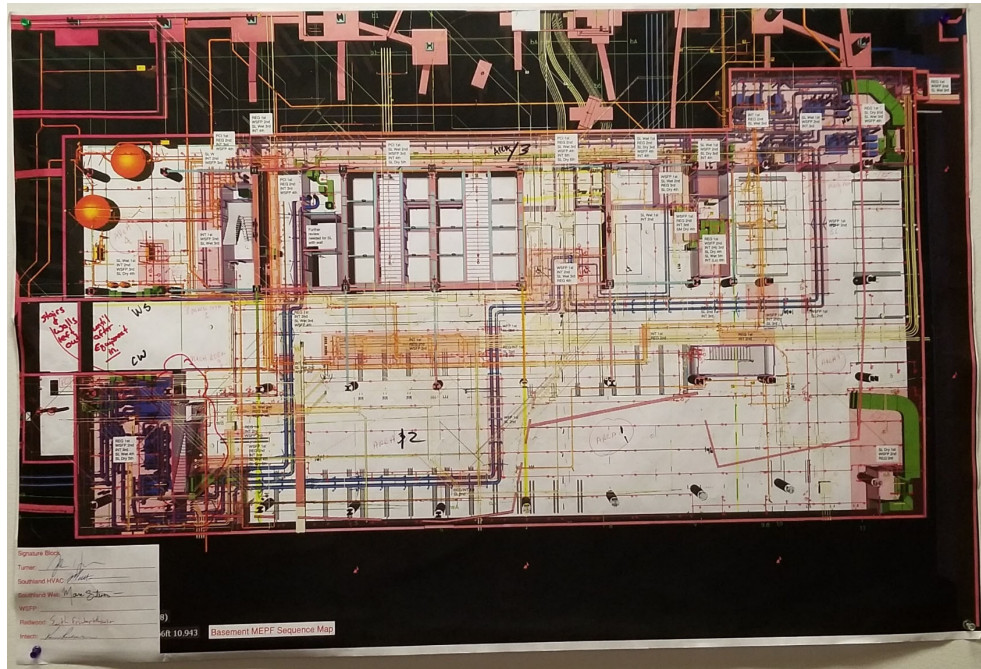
Detailed projections of building floor plan used as reference in weekly work planning
